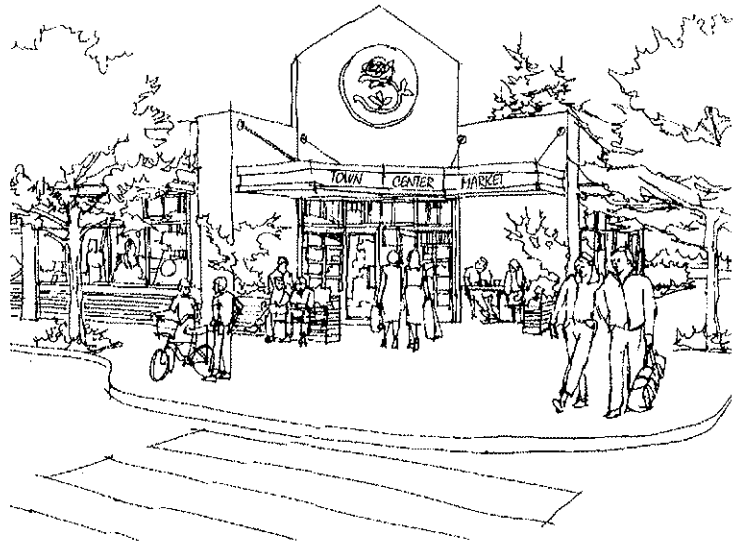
This example includes both a building located towards the street corner and a small pedestrian-oriented space.
